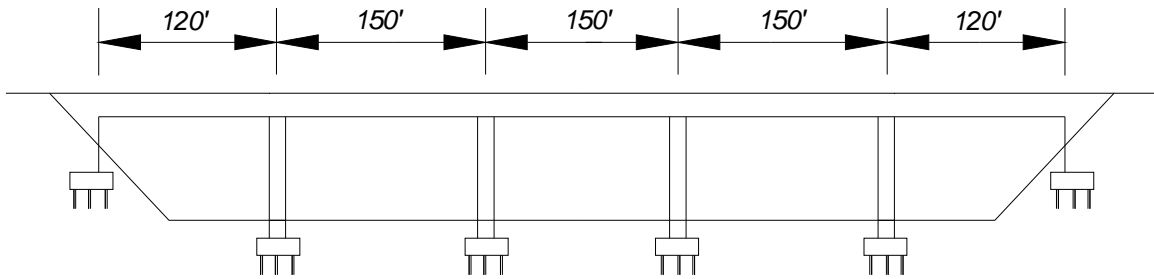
Elevation of prototype bridge (Ketchum et al. 2004).
